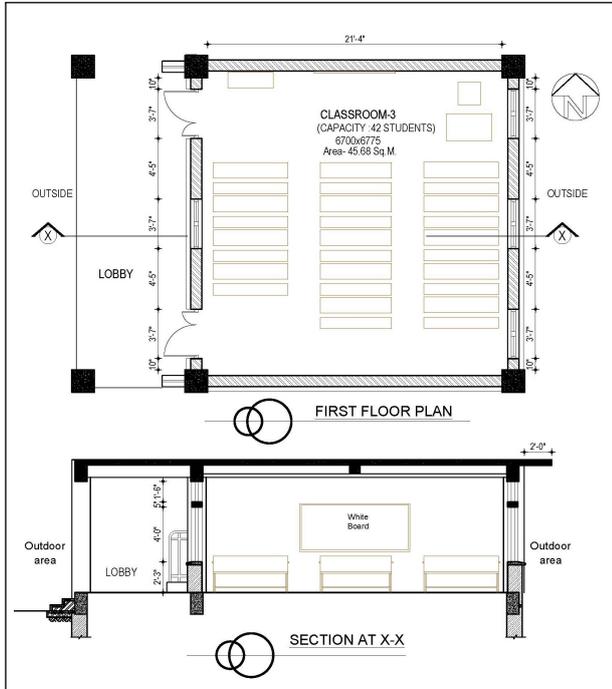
Classrooms Detail plan and section of Shree Tika Vidhyashram Secondary School Classroom
